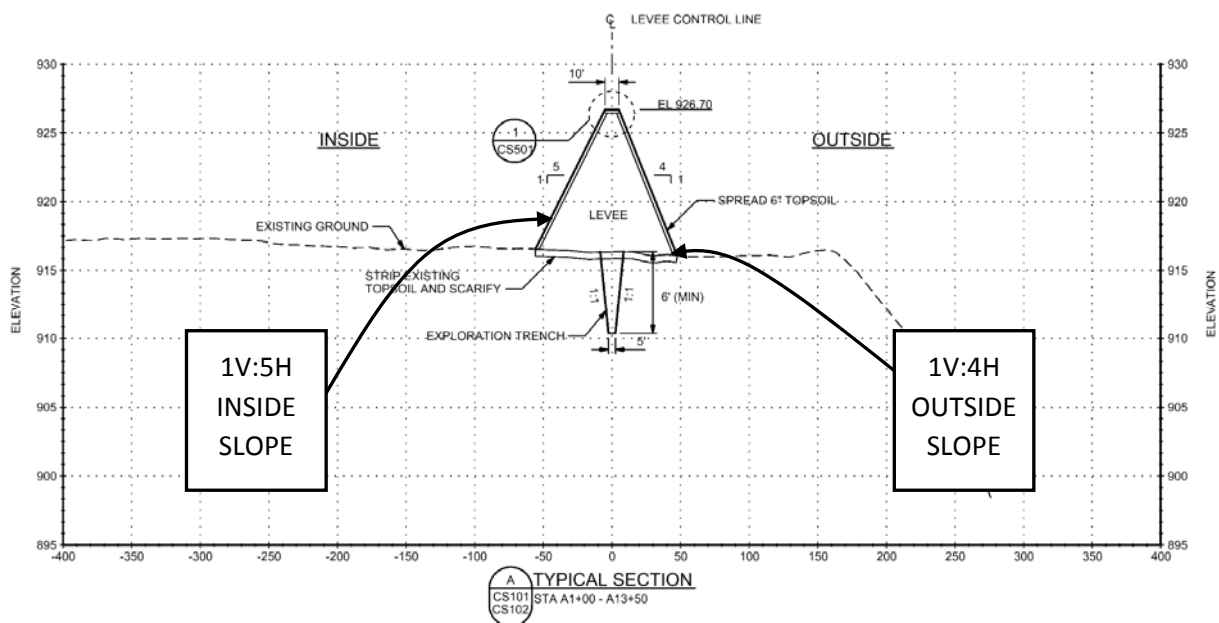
Preliminary Plan Drawing of a Typical Section of the OHB Levee.
